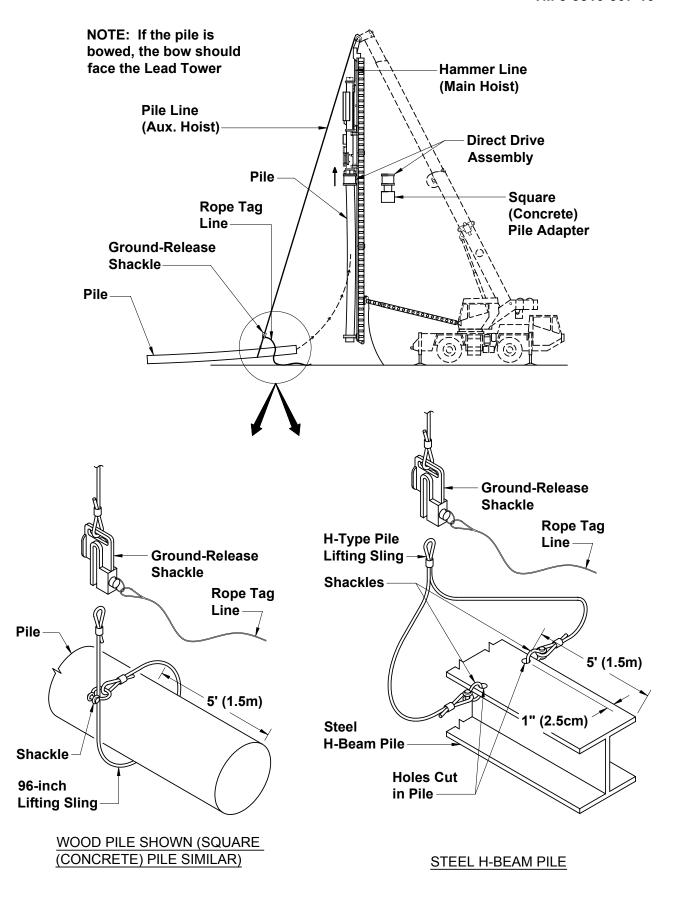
Set-up Pile (Wood Shown, Steel H-Beam, and Concrete Similar)
